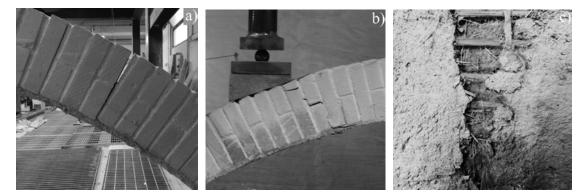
Failure details of PBO-FRCM intrados strengthened arches: a) first hinge; b) masonry crushing; c)debonding at the textile-mortar interface.
